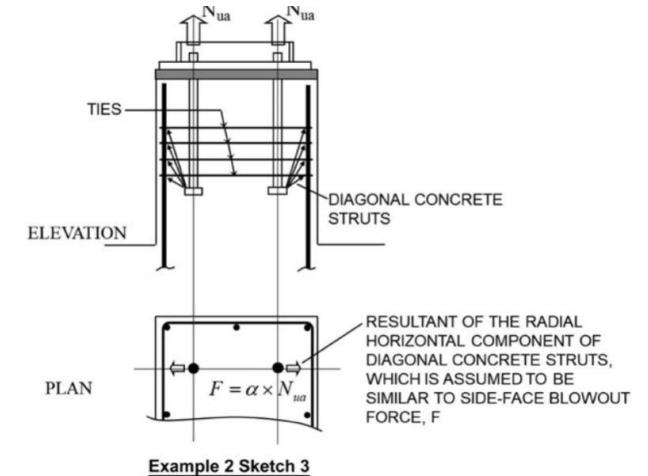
The use of steel reinforcement for restraining shear concrete breakout.
